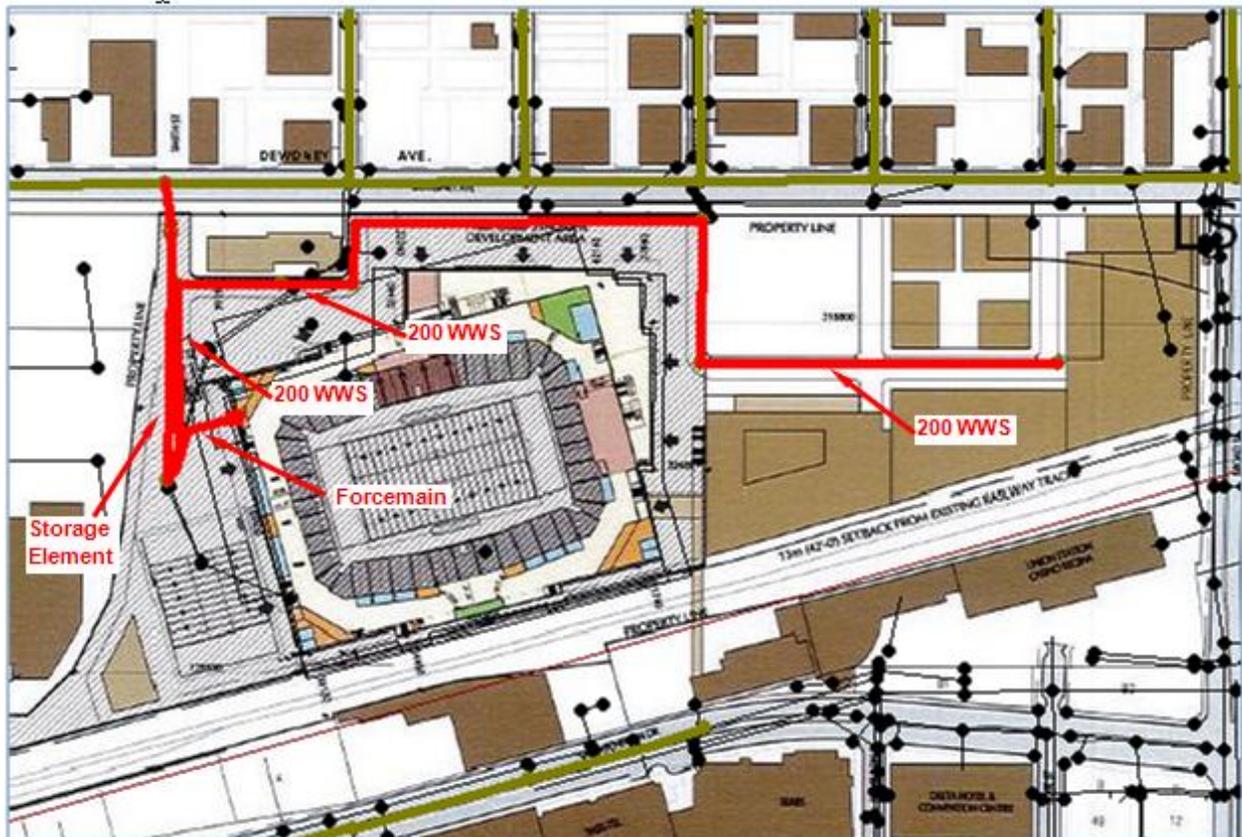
Alternative 1 Depiction - On-Site Storage Servicing Concept
